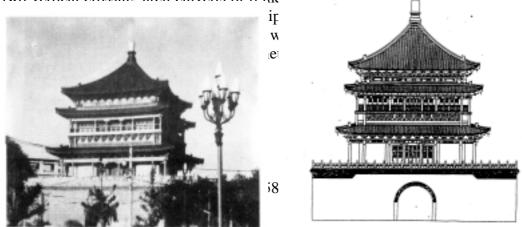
Bell Tower in the center of Xi'an Fig.2 the photographic surveying of Bell Tower
